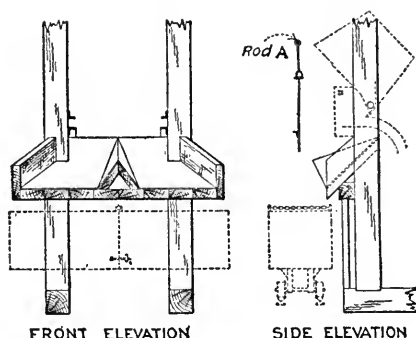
DUMP ARRANGEMENT FOR UNDERGROUND HOIST.
